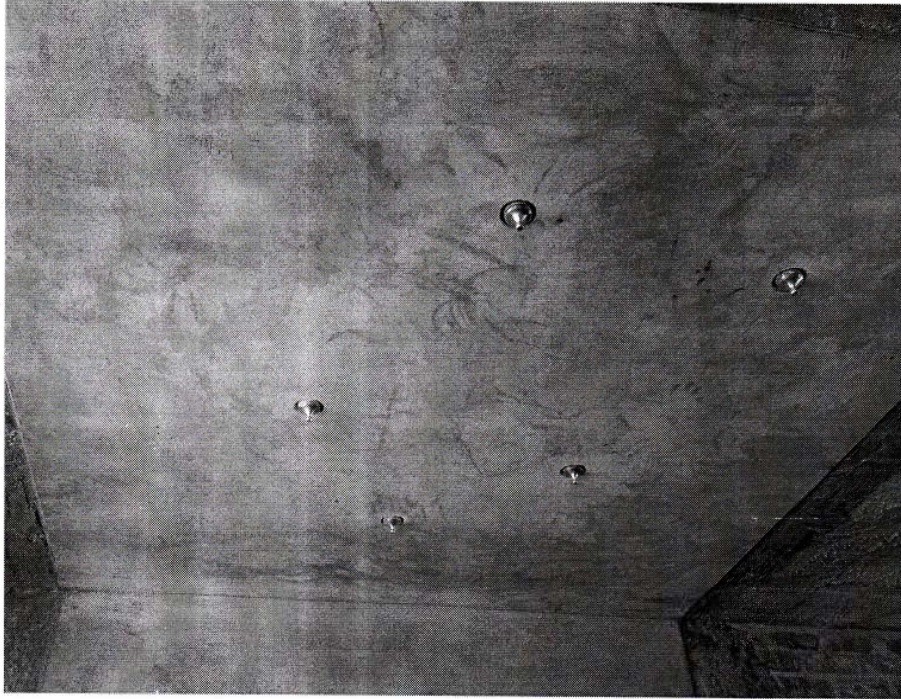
Special metal plates bonded to the in-place plaster surface on a concrete slab
